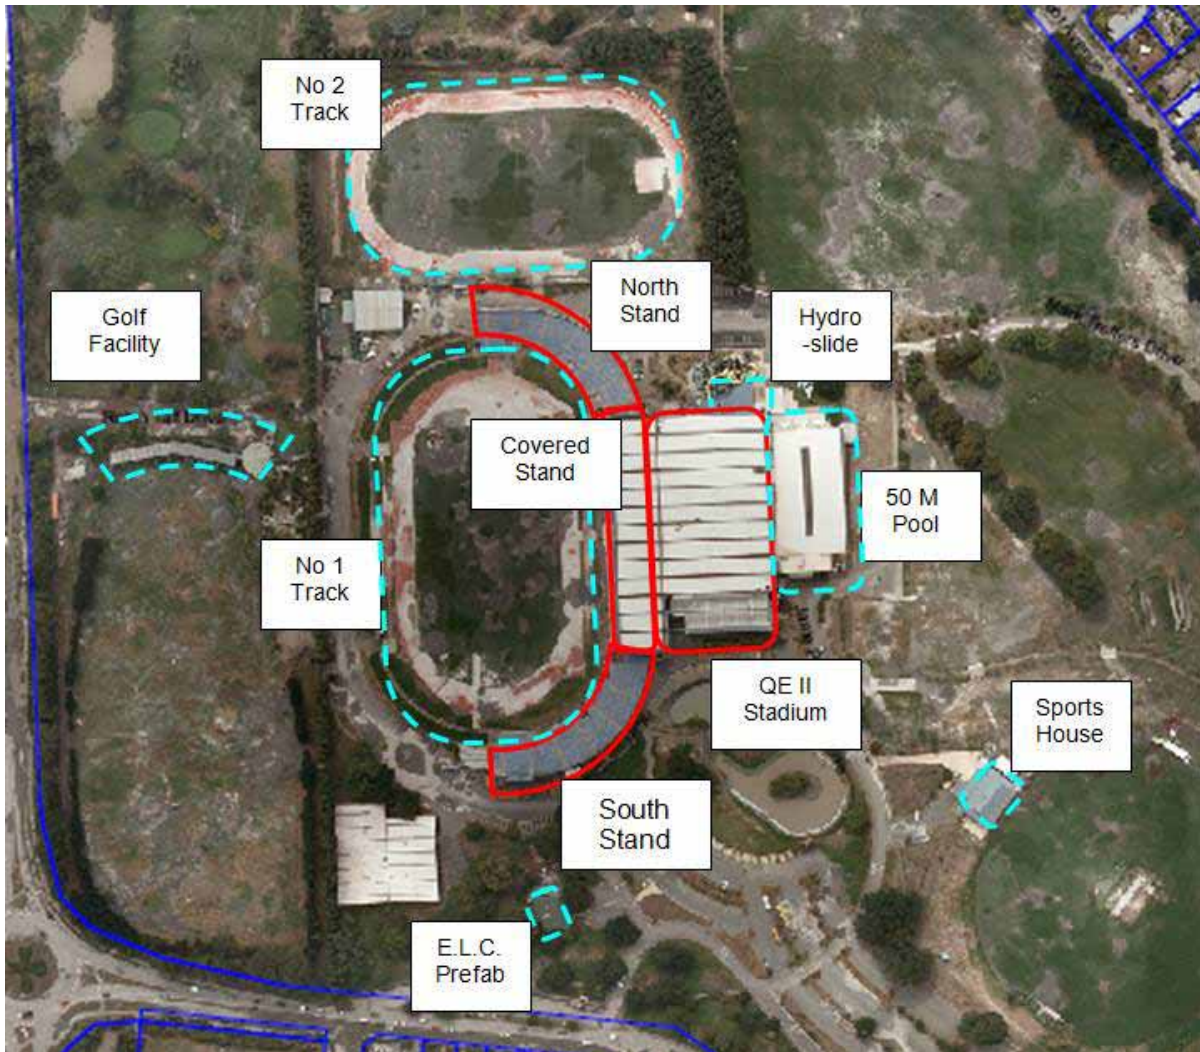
QE II - Site Plan (Cera demolition outlined in Red / other facilities outlined in Teal)
